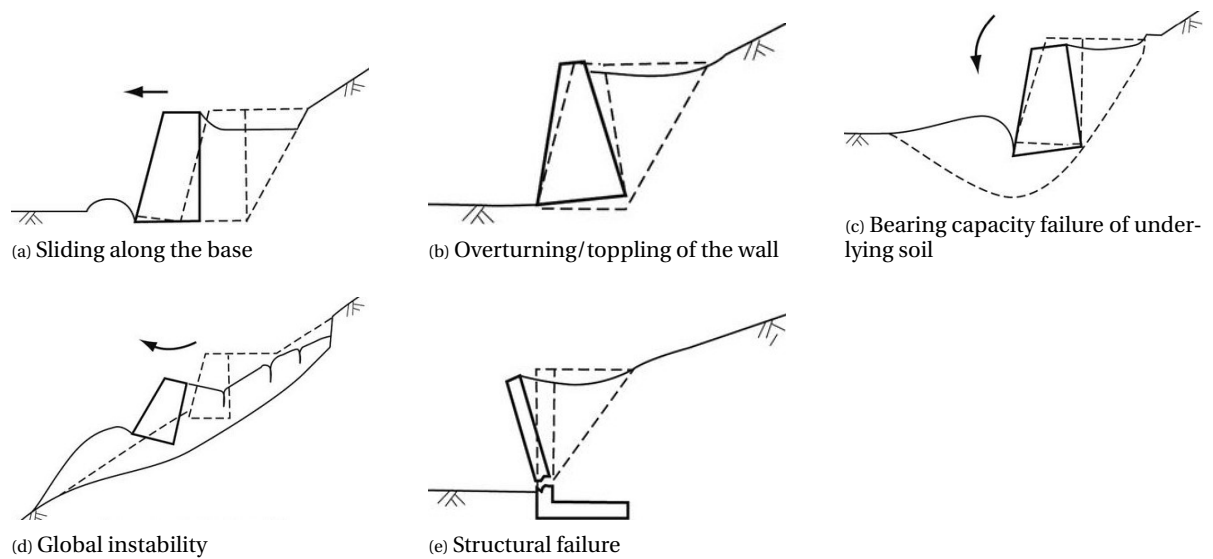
Different failure mechanisms of a retaining wall. (Perera, 2018)
